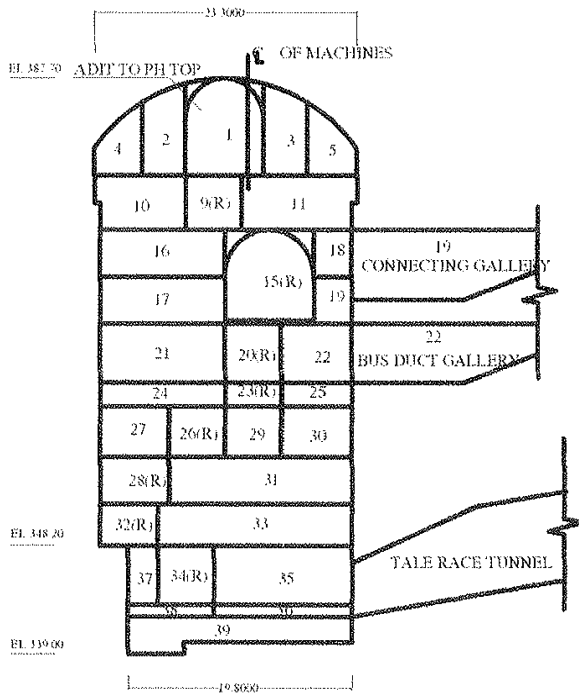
EXCAVATION SEQUENCE OF POWER HOUSE
